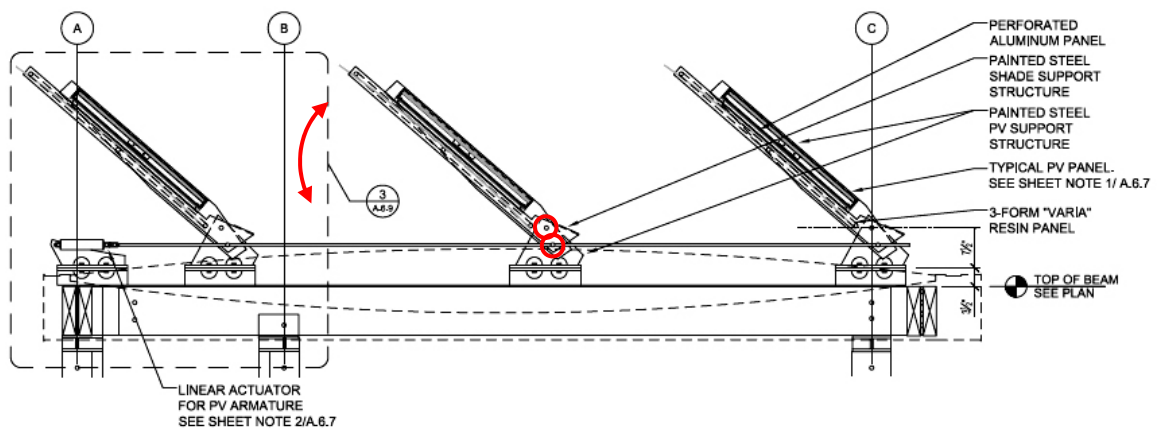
Typical section – shades in full retraction (Fall, 2006).
